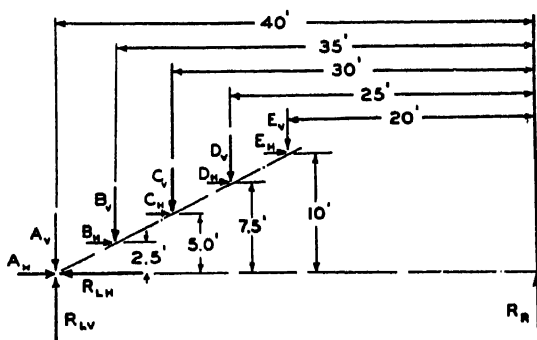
Skeleton Layout for Truss with Wind Loads from Left.
